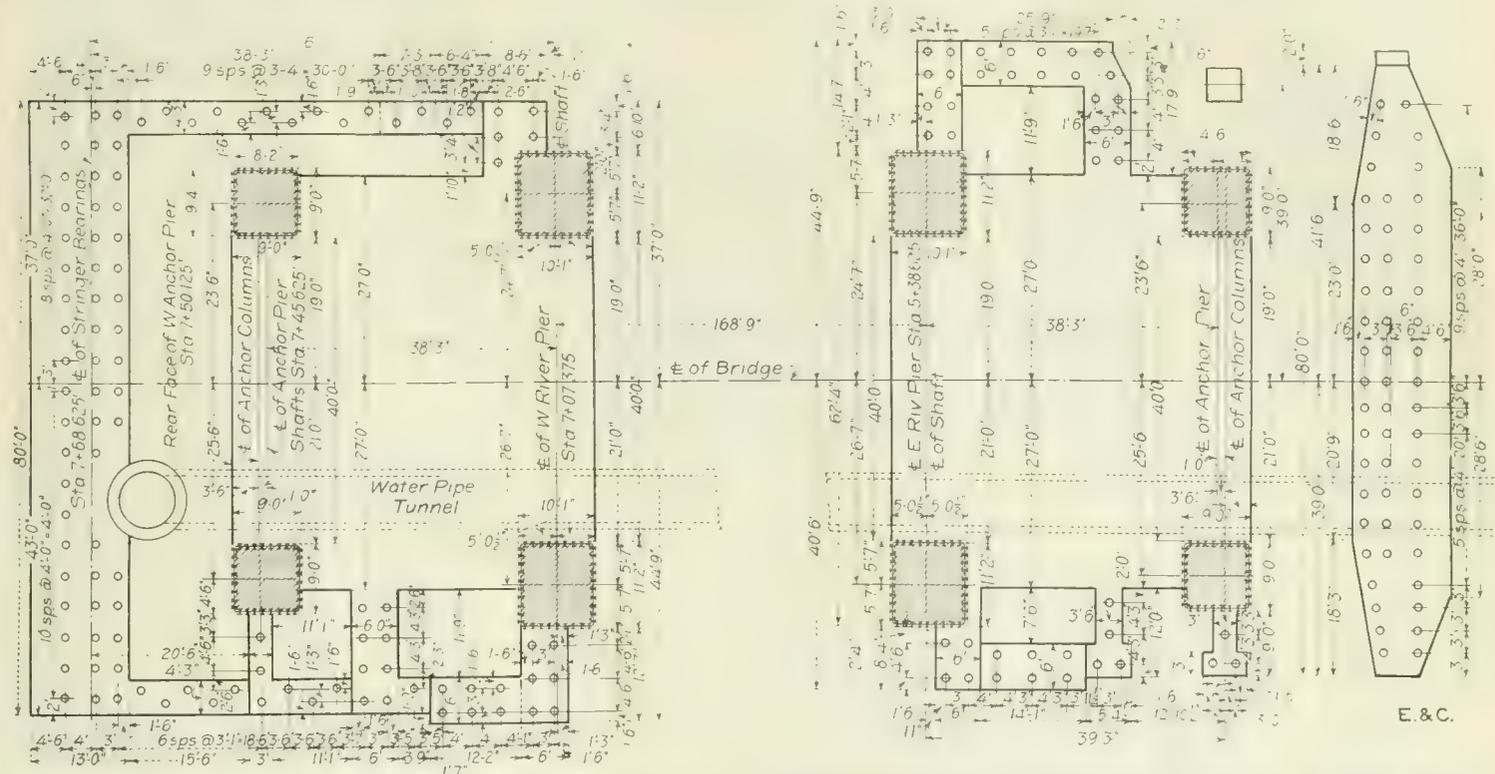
Foundation Plan of the Chicago Ave. Trunnion Bascule Bridge, Showing General Dimensions and Location of Piers, Walls and Abutments.
